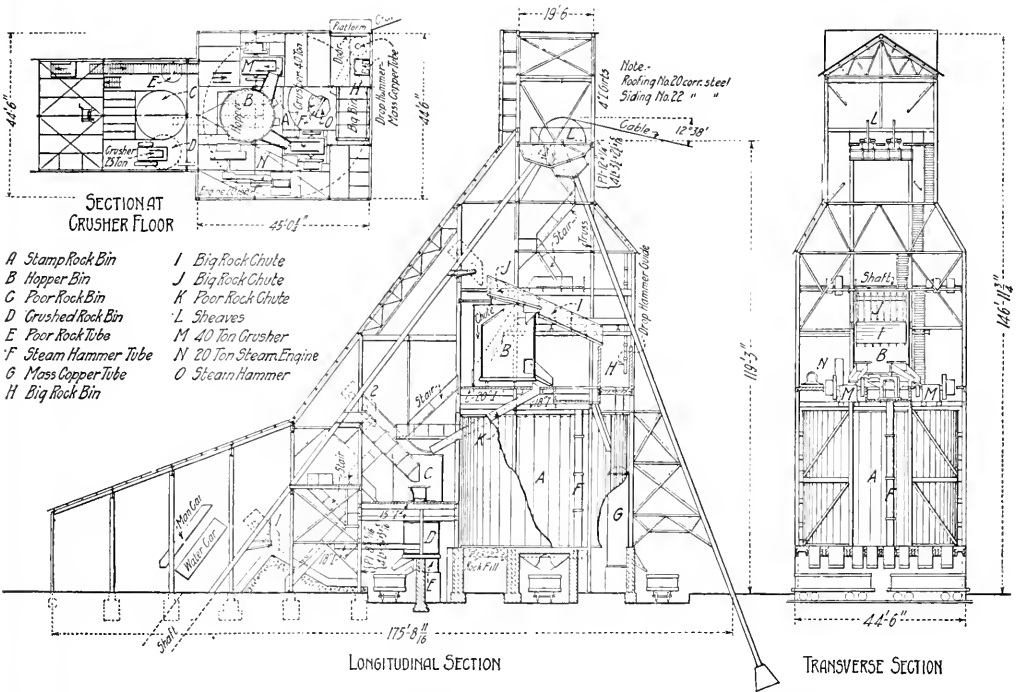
PLAN AND ELEVATIONS OF QUINCY No. 2 SHAFT-ROCKHOUSE
